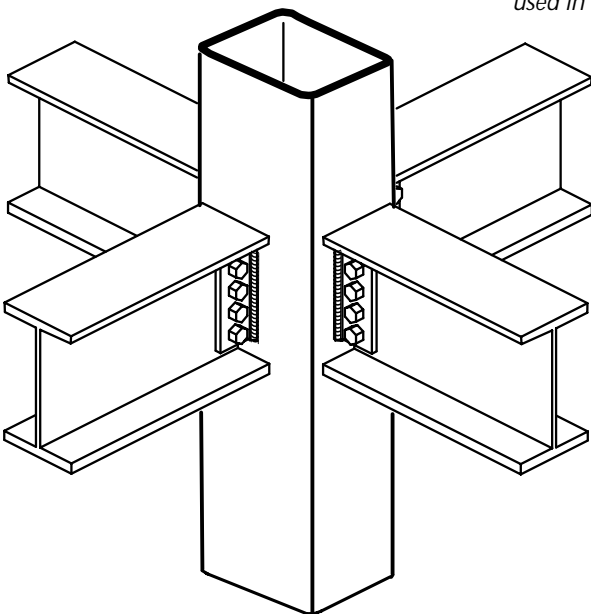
Fin plate. Beam-to-column and beam-to-beam connections
